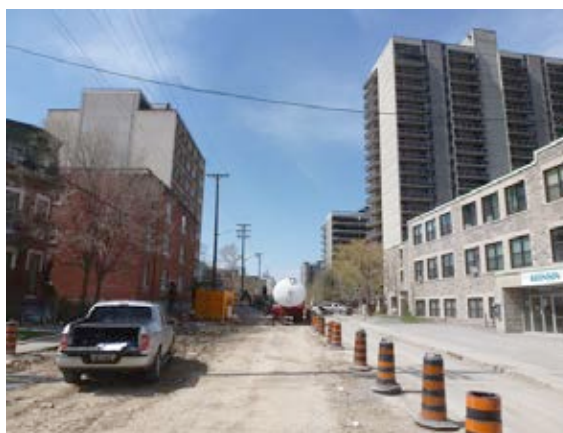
Bronson Avenue north, towards subject properties, showing proximity of tall buildings.
